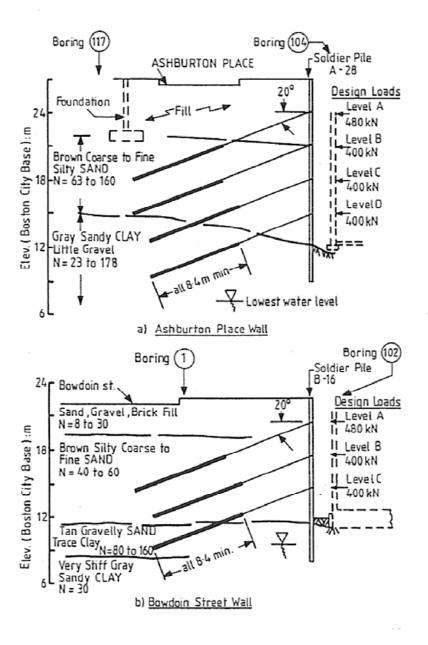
Typical tied-back wall arrangements for Ashburton Place Garage, Boston (from Hanna, 1982)
